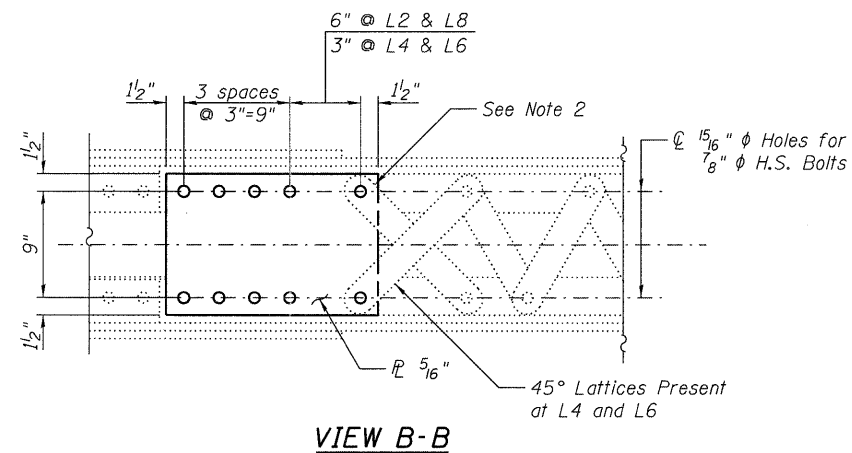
STAY PLATE AT PANEL POINT
